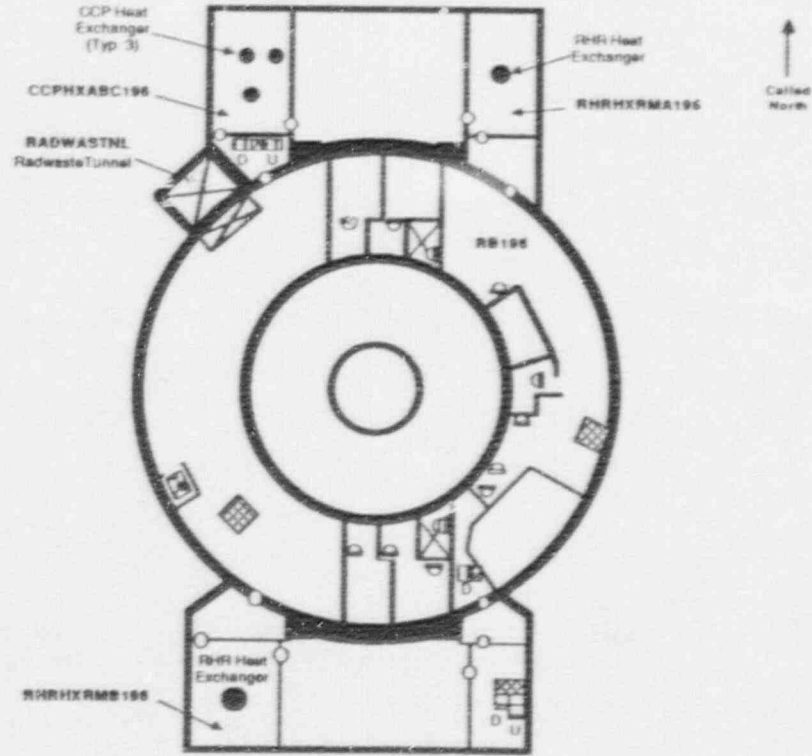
Nine Mile Point 2 Reactor Building, Elevation 196'-0"
